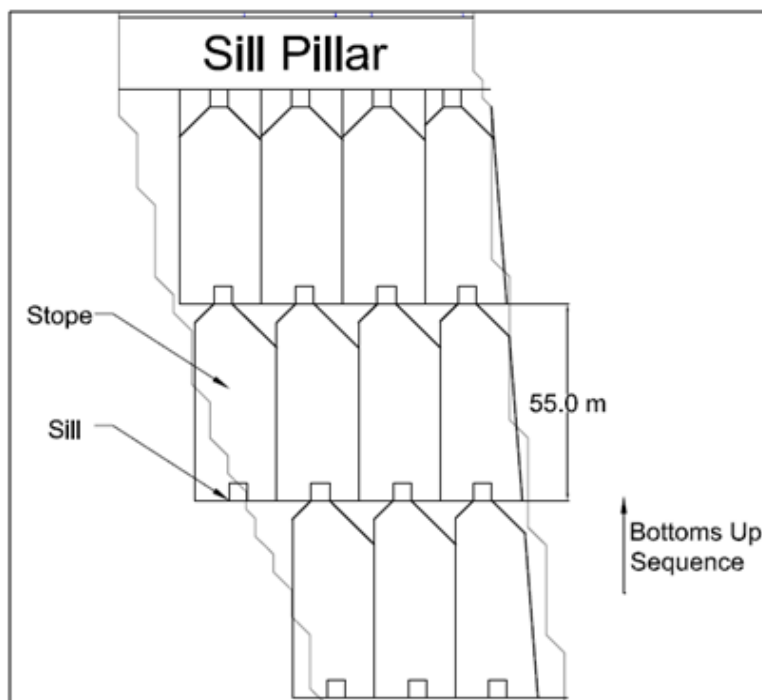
Pillarless Overhand Blasthole Mining Section
